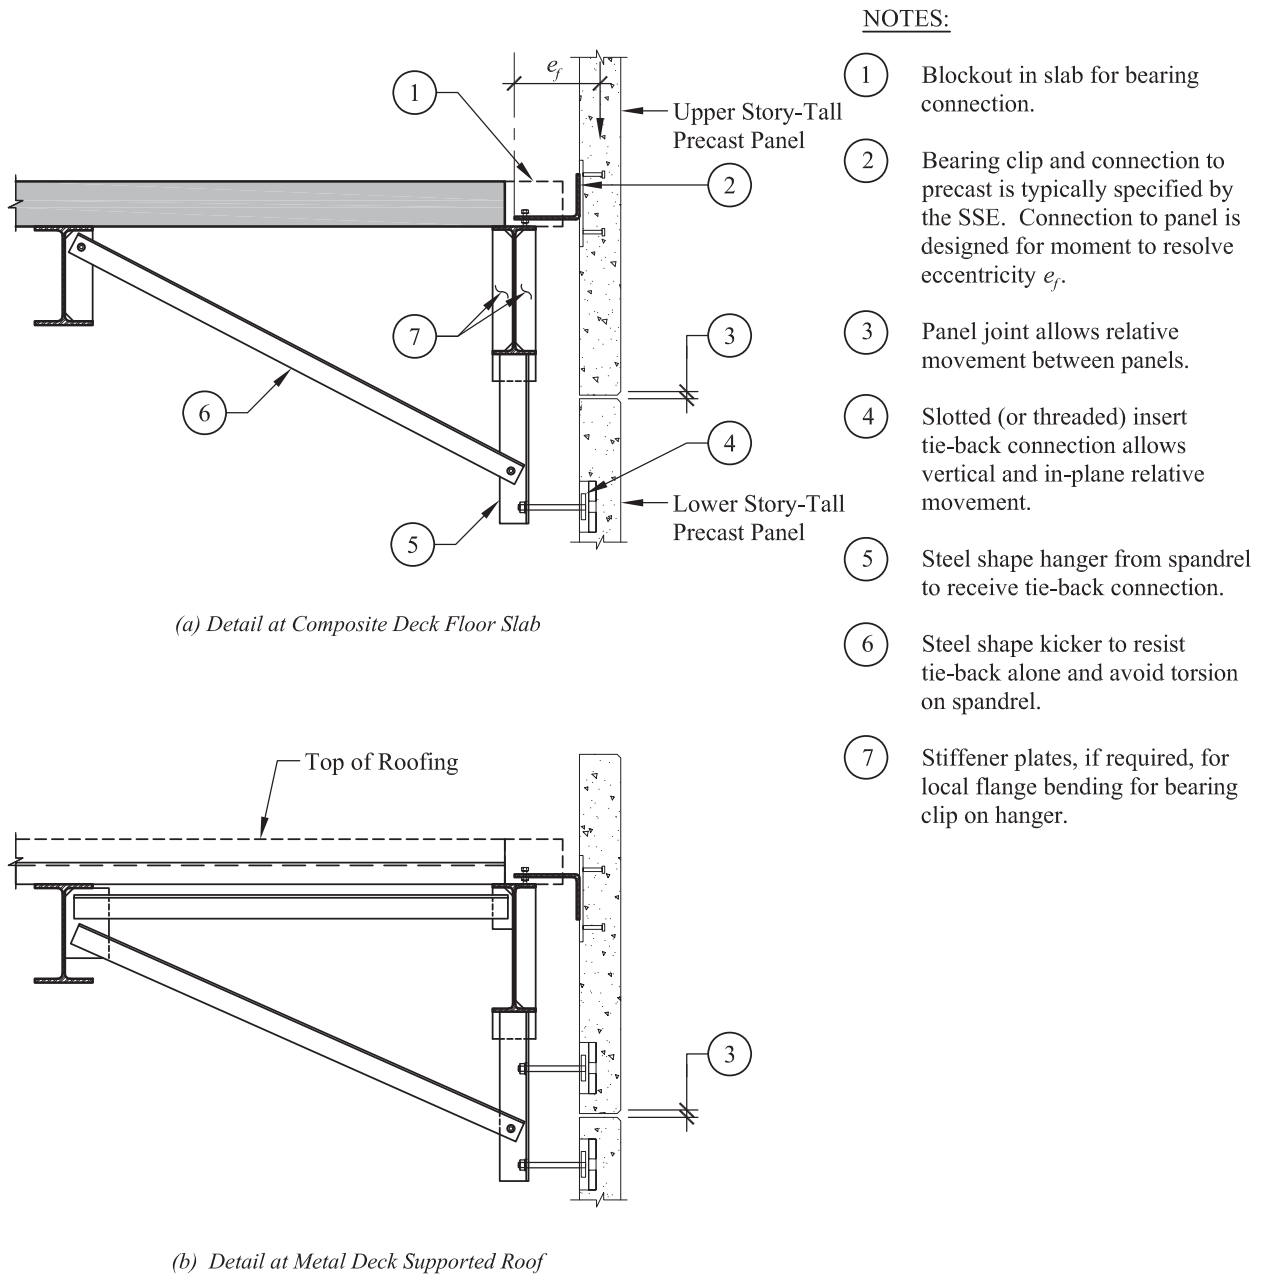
Typical spandrel-supported story-tall precast panel.
